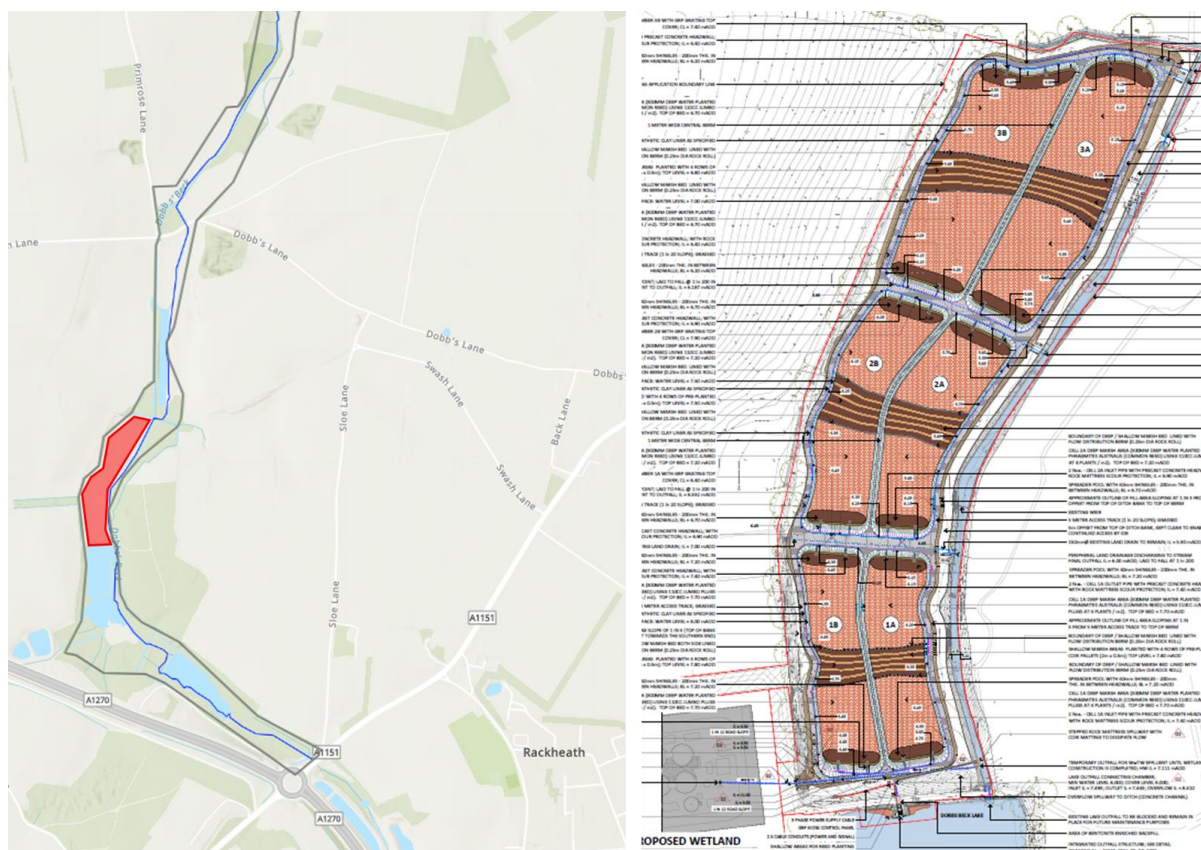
Location plan (left) and site plan (right) showing proposed new wetland. The proposed WwTW will discharge treated effluent from 1300 houses into the wetland, which will then discharge to Dobbs Beck (dark blue line within the location plan).
